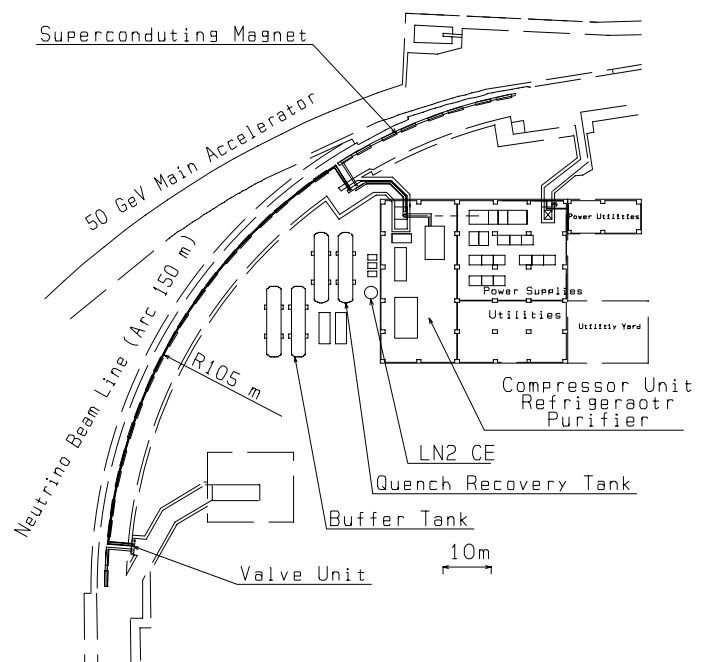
Arc section of the neutrino beam line and layout of the magnets and cryogenic components.
